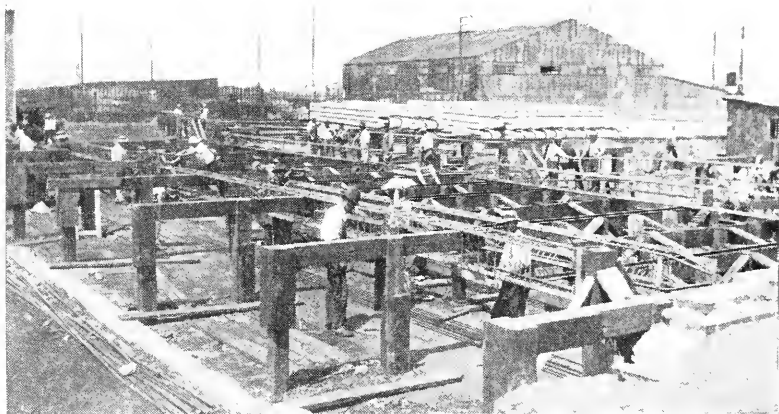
CONSTRUCTION OF CONCRETE PILES.
